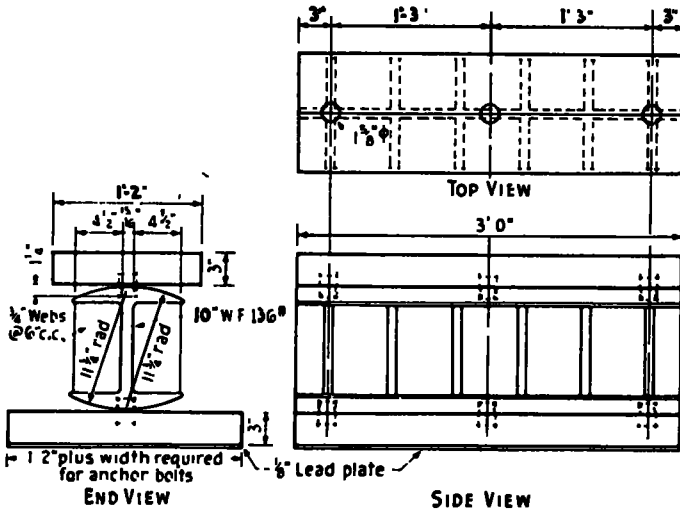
Typical Rocker Detail. From Portland Cement Assn: "Concrete Bridges"
